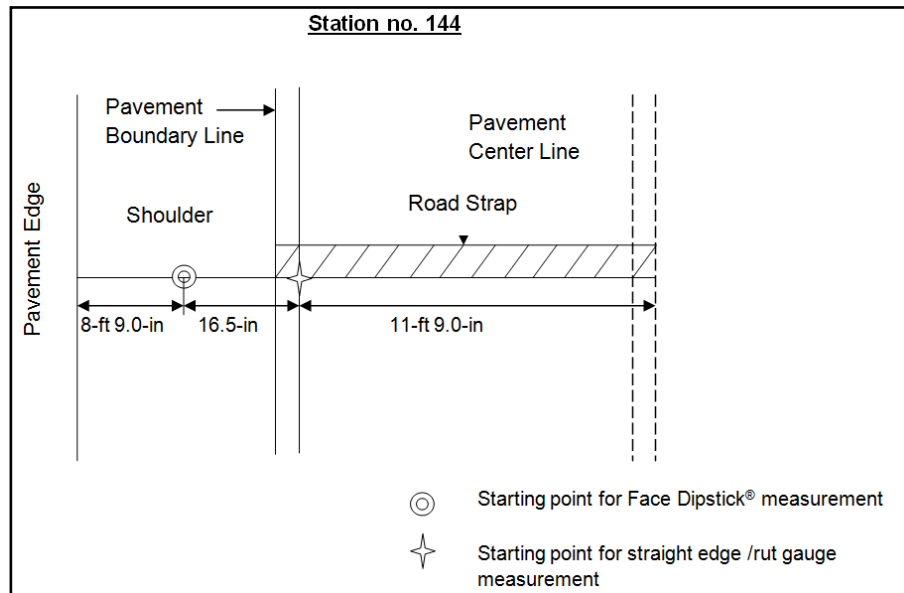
Rough Sketch of Pavement Section at Station 144
